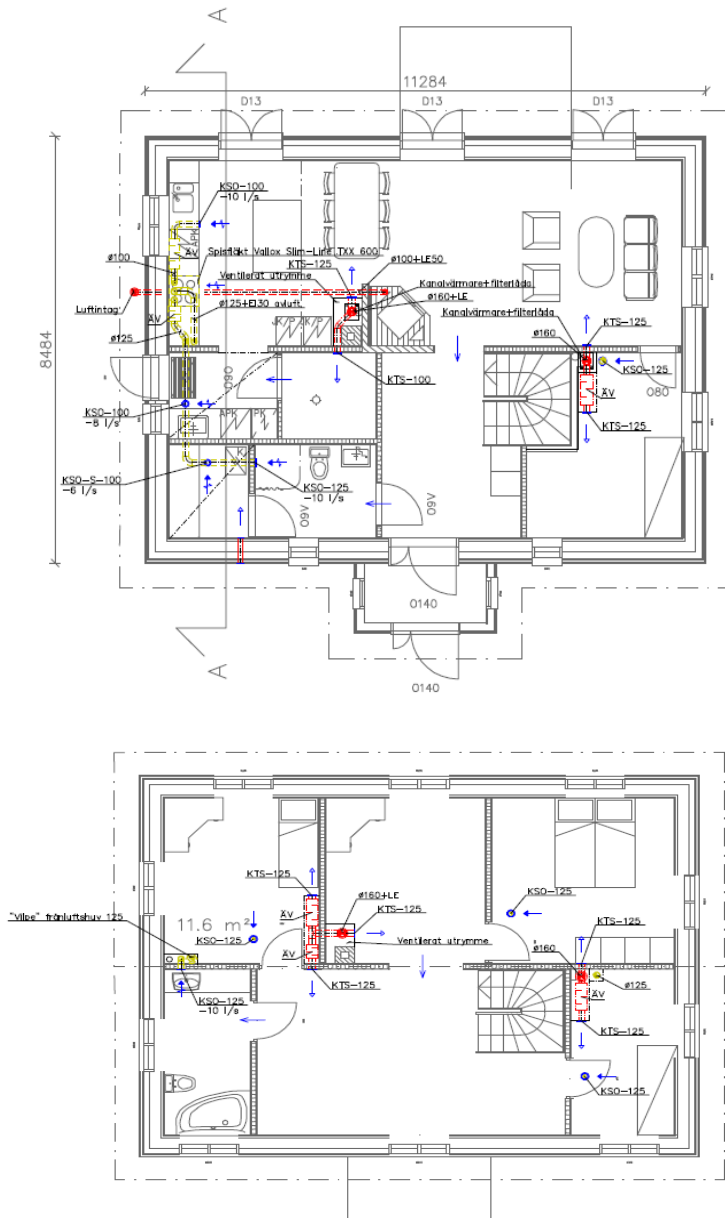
Ventilation plan of 1st and 2nd floor of Närpiö house
